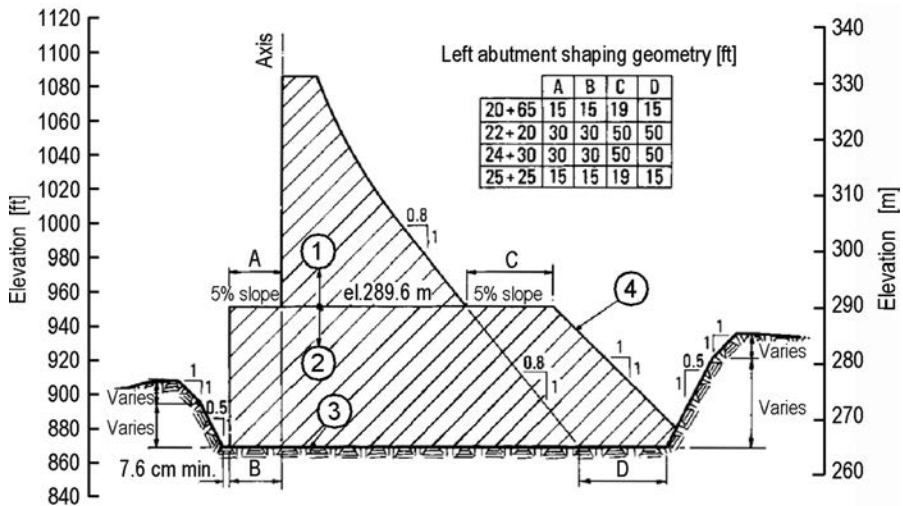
Cross-section of the Olivenhain dam through the left abutment shaping block (after Dunstan, 2002). (1) Dam body; (2) left abutment shaping block; (3) top of foundation rock (varies); (4) unformed RCC downstream face.
